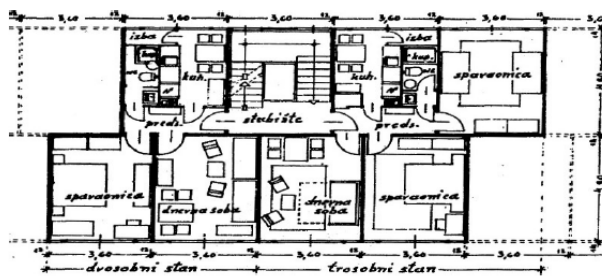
Typical plan layout of a JU-61 prefabricated, residential building
